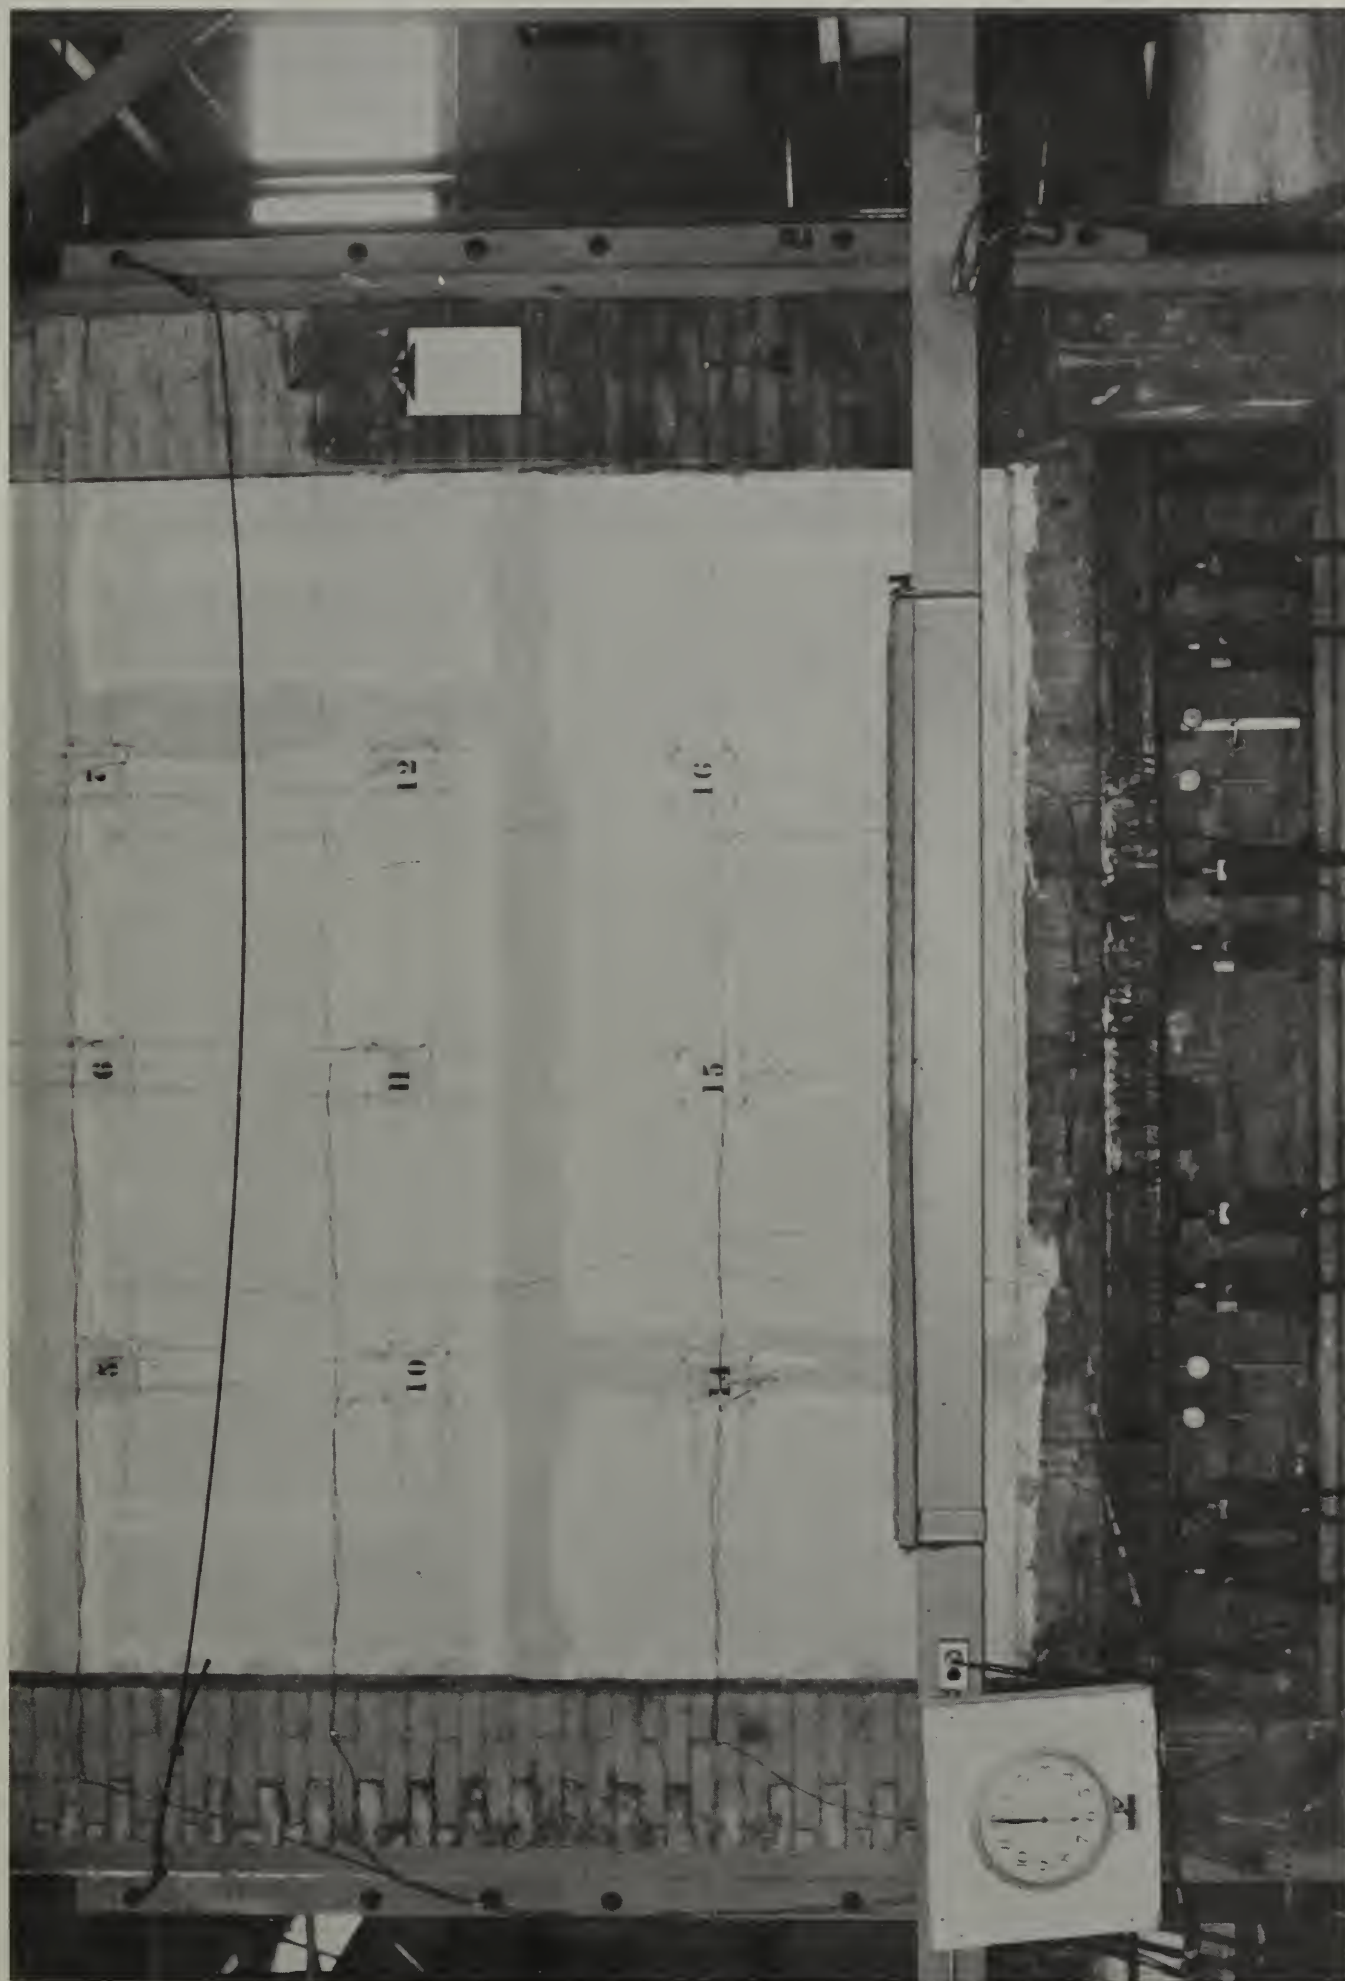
The unexposed side of the assembly; the thermocouple connections, loading equipment, the lateral and the vertical deflection measuring device.
